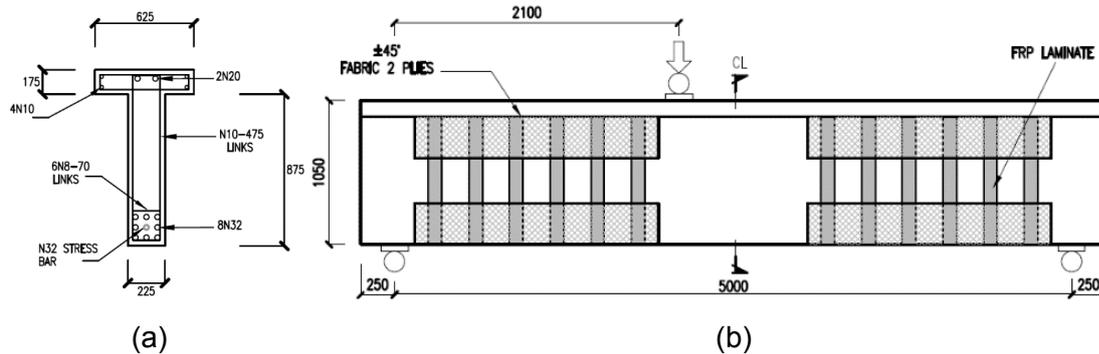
(a) Cross section of the beam; (b) strengthened specimen with CFRP sheets anchors
